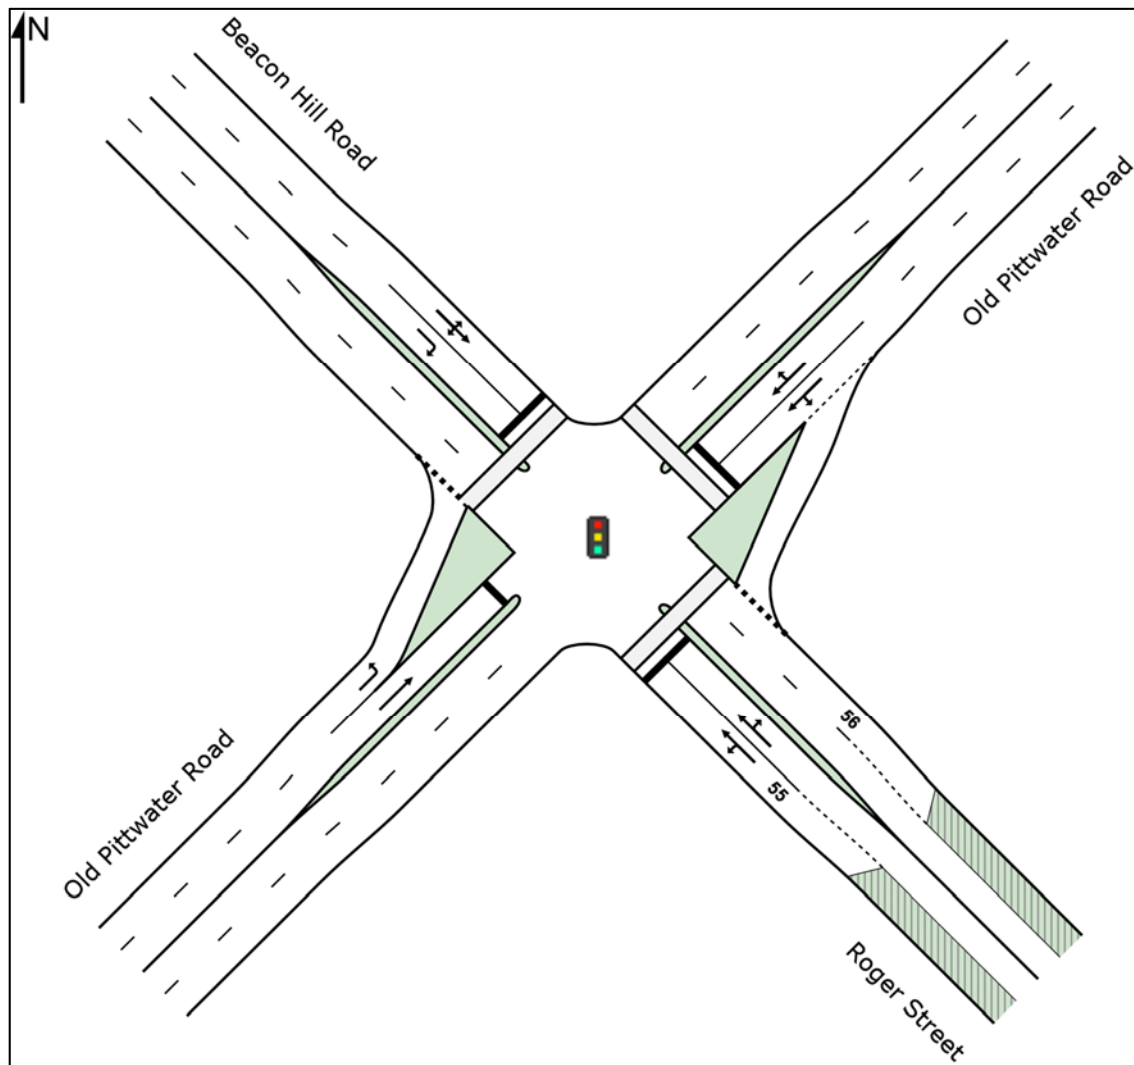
Signalised intersection of Old Pittwater Road with Beacon Hill Road and Roger Street (SIDRA)
